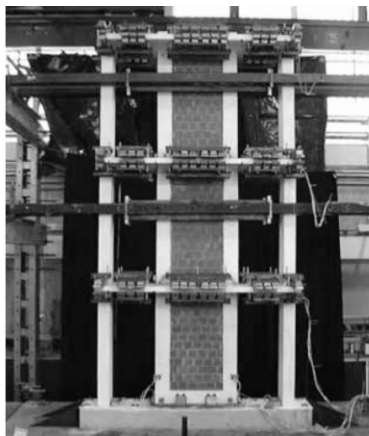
Detailing of a post-tensioned wall, providing load paths for the high compression forces during rocking, Holden [2001]
